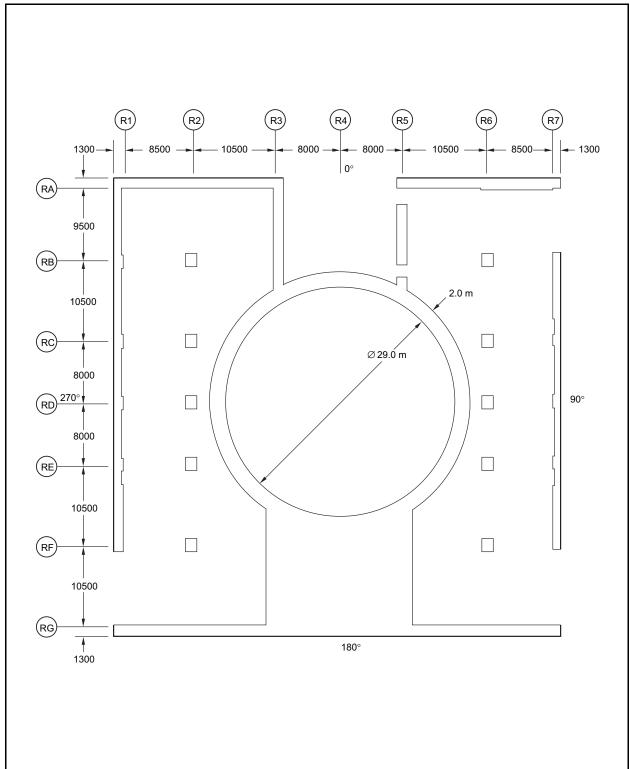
Reactor Building Arrangement Floor 2F Elevation 18100 mm
